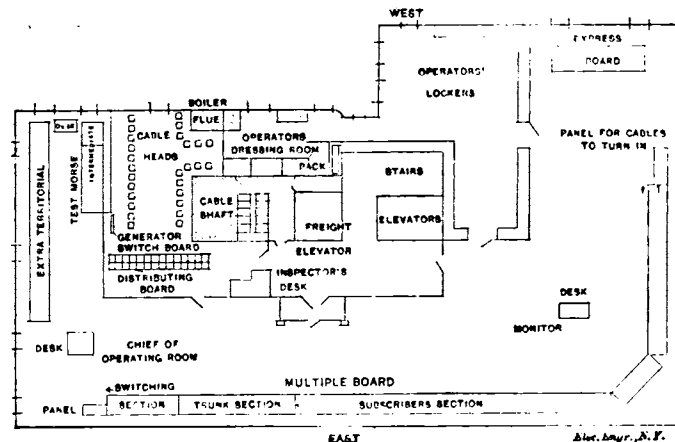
PLAN SHOWING ARRANGEMENT OF MAIN OPERATING ROOM.
